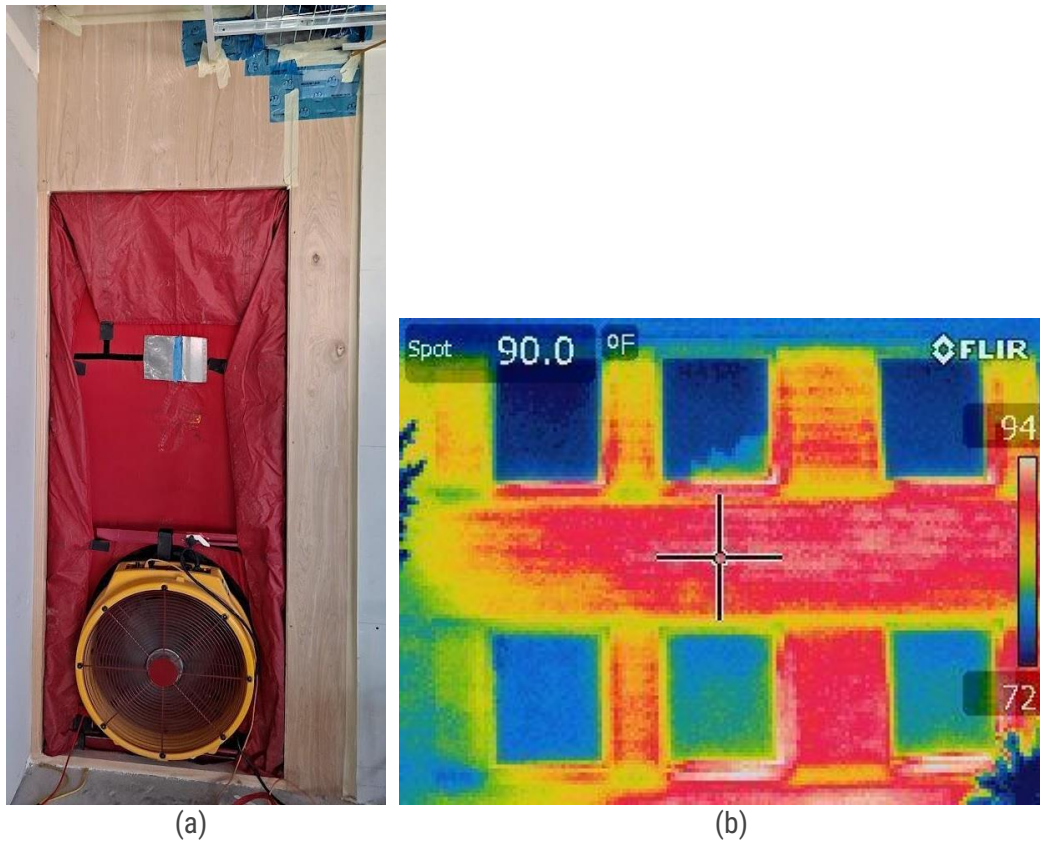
(a) Blower door test and (b) thermal images of Denver Federal Center's Building 40.
